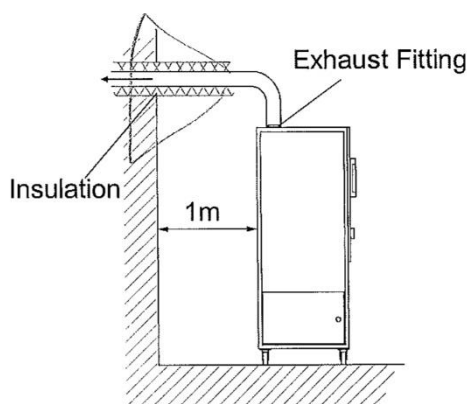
Distance to the Wall and Exhaust Pipe
